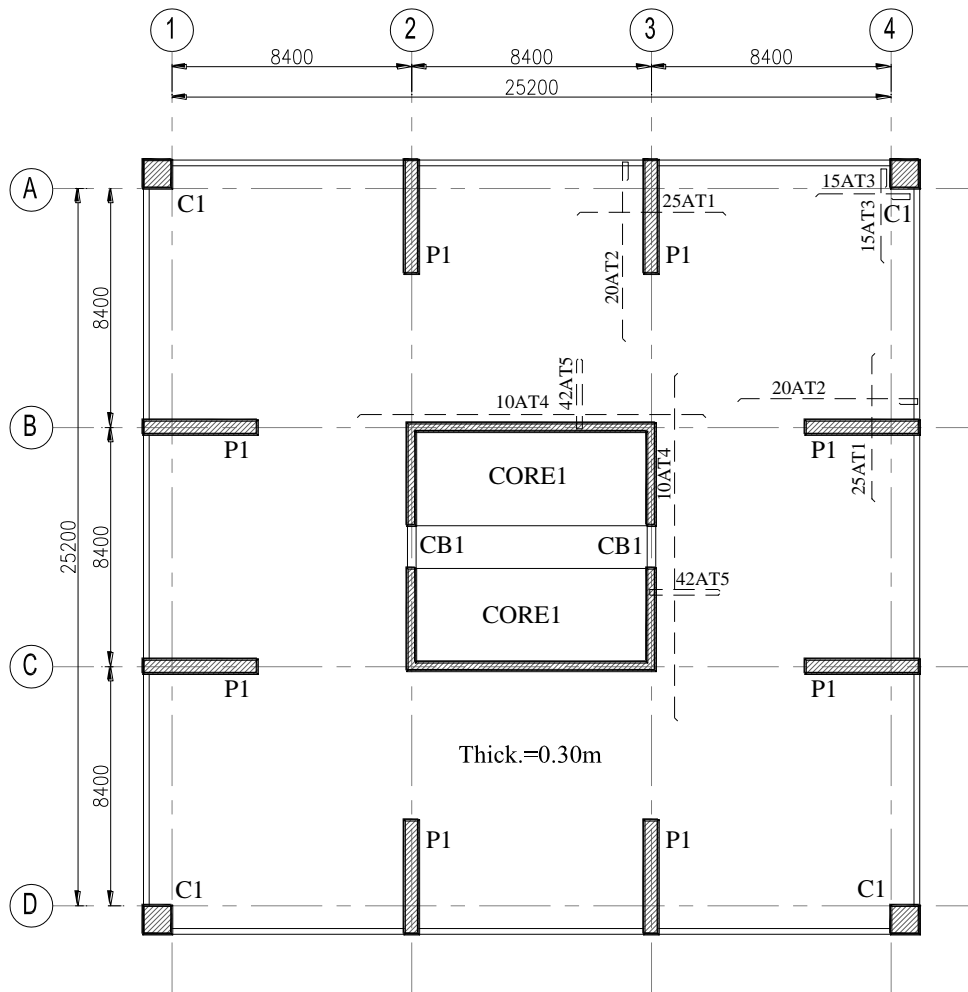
Typical reinforcement details for the floor slabs of the 18-story and 26-story buildings
